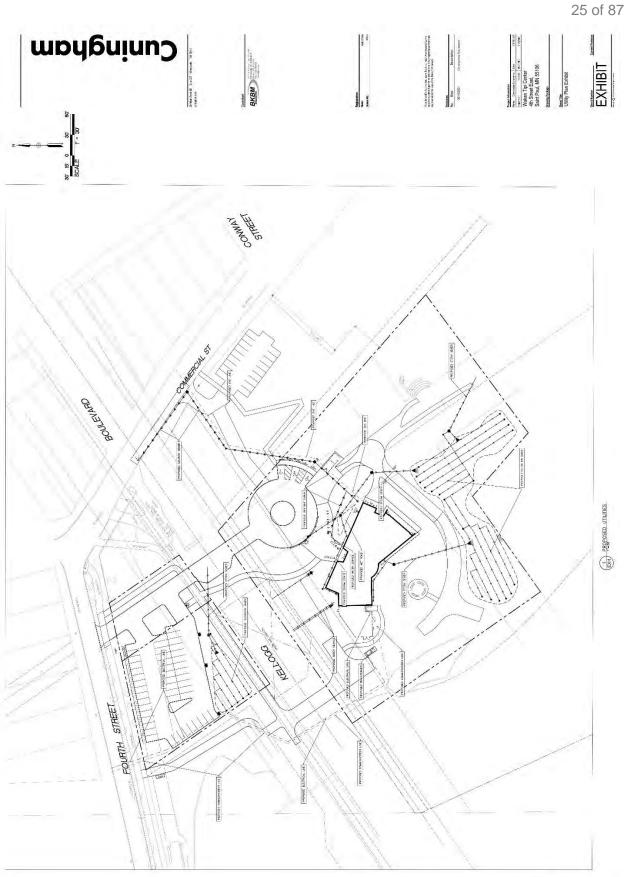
Utility Plan (also provided Under Separate Cover)
